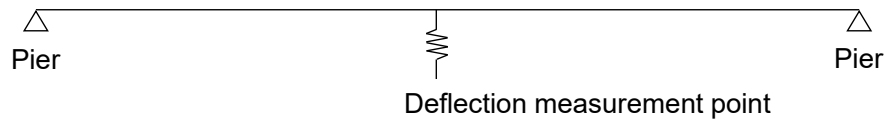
Loading Locations and Deflection Measurement Points (Unit: mm)
